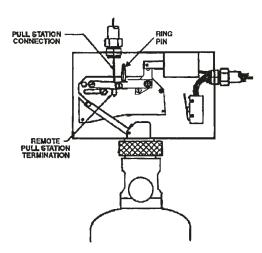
Single Cylinder Installation Using Model ECH3/MCH3/NMCH3 Control Head.
